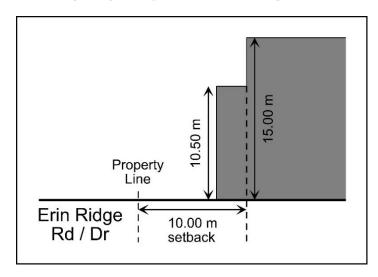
ICC Building Height Adjacent to Erin Ridge Drive and Erin Ridge Road
